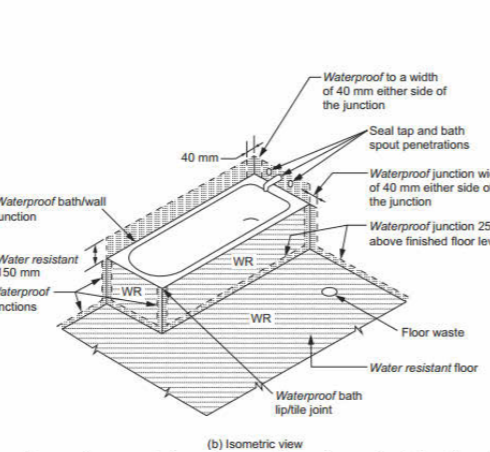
Areas adjacent to baths and spas without showers for concrete, compressed fibre-cement and fibre-cement sheet flooring
